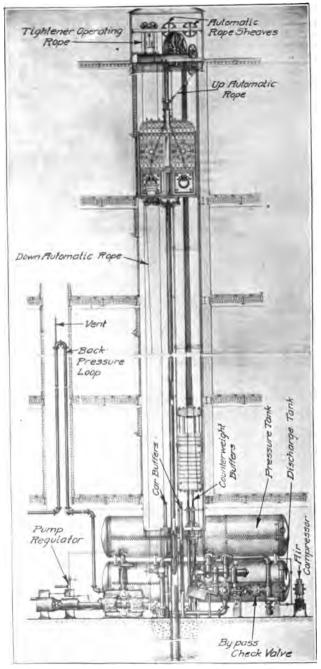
Vertical Section of Typical Back-Pressure Loop Elevator Installation Courtesy of Standard Plunger Elevator Company, Worcester, Massachusette
